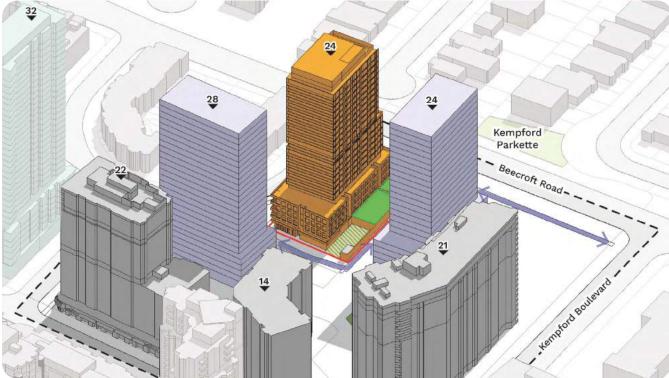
Block Context Plan - Axonometric View Looking Southwest
